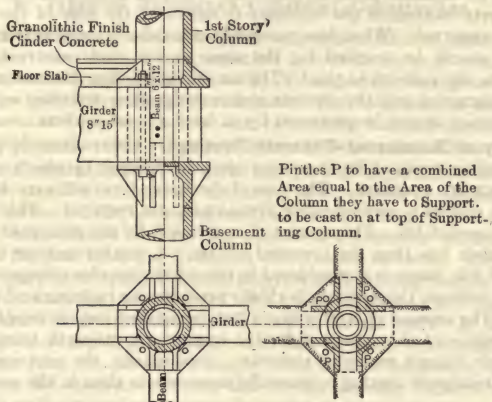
Connections for Cast-iron Columns and Reinforced-concrete Construction
